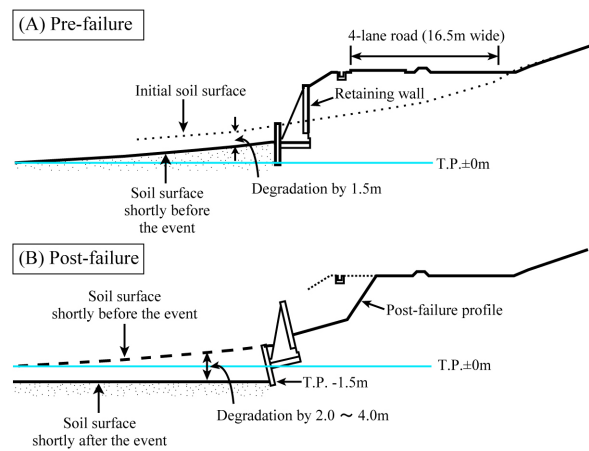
Pre- and post-failure profiles of retaining-wall-supported seaside road, with stages of degradation of the fronting sandy beach (adapted from Yokohama Road Office, 2007)
